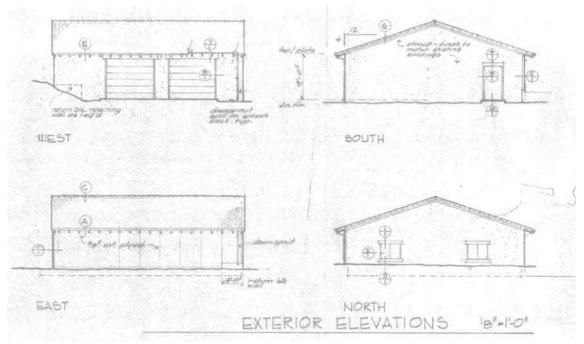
Exterior elevations of Building 5. Source: Robert Goetz Associates, drawings dated June 23, 1967, revised July 13, 1967.
